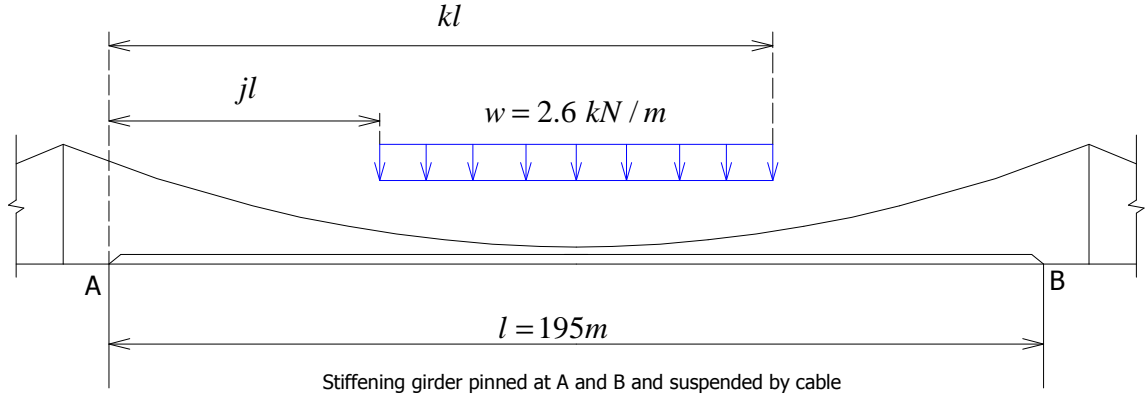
Loading of bridge to determine horizontal cable tension due to maximum live load.
